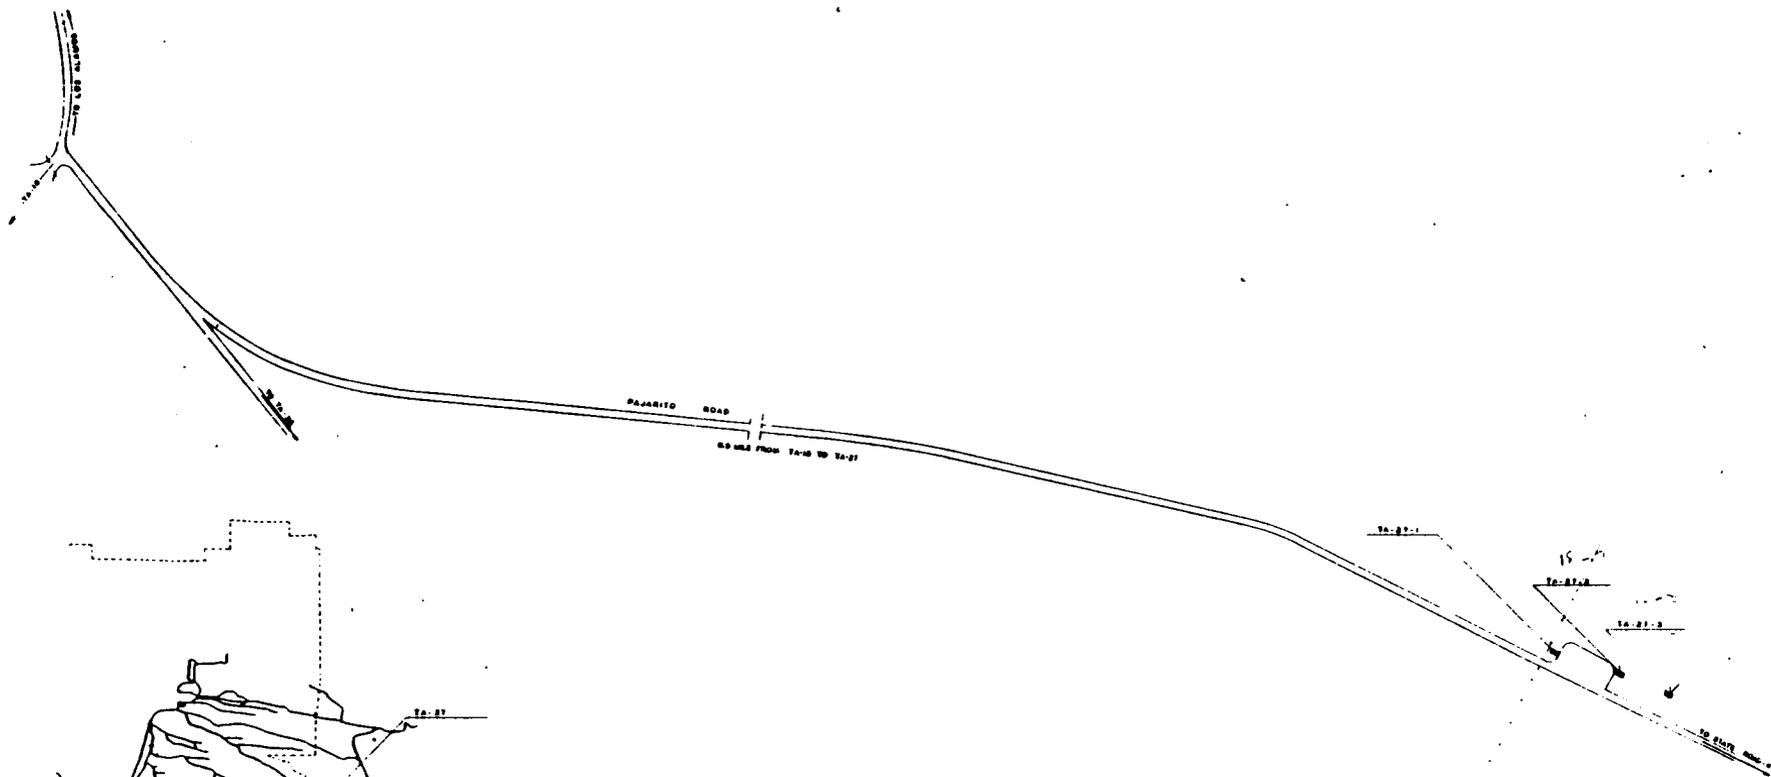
Location and Site Plan for TA-27 - Gamma Site, along Pajarito Road east of Pajarito Site (1956 Drawing from the LANL Technical Area Structure Location Plans)
